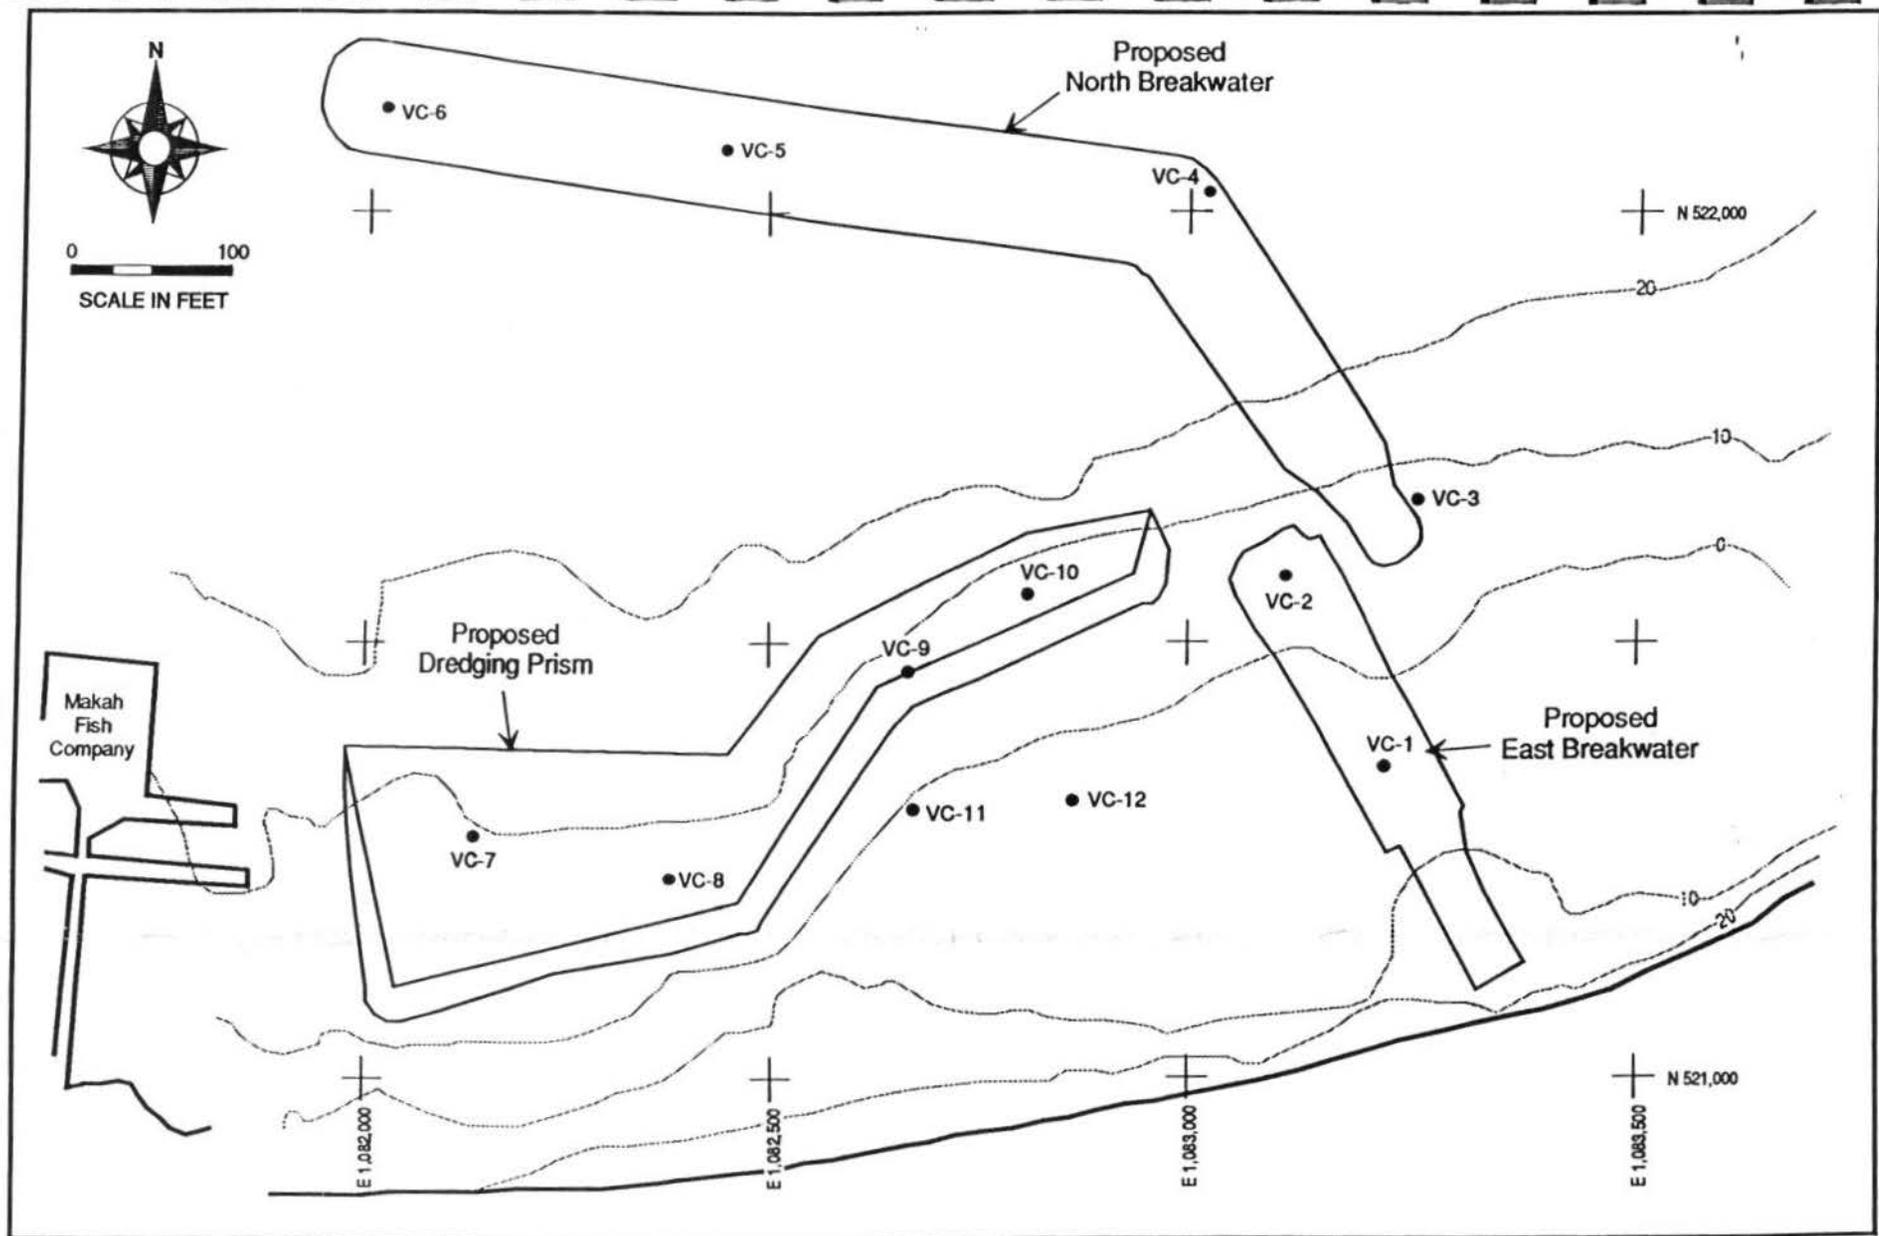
Sampling locations at the proposed marina site at Neah Bay, Washington.
